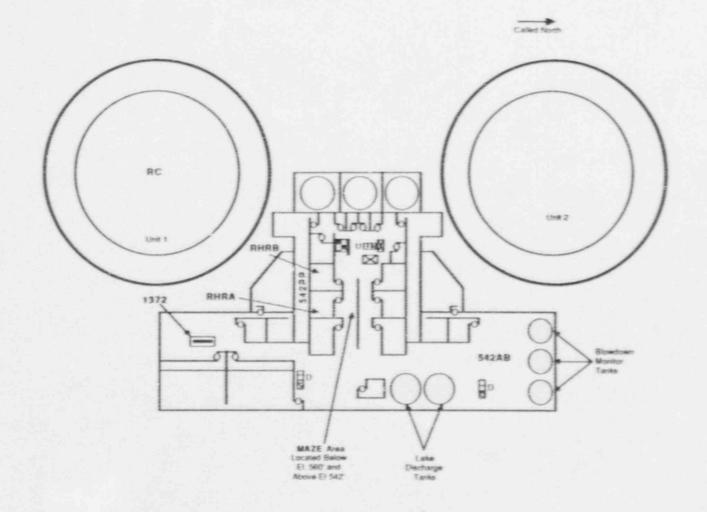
Zion 1 and 2 General Arrangement, Elevation 542'
